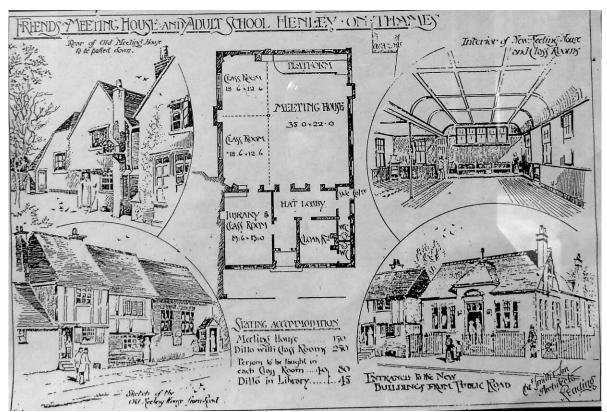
Architect's drawing of the old meeting house (left above and below) and the new (plan, interior and exterior) (northeast is at the bottom of the plan; not to scale)
